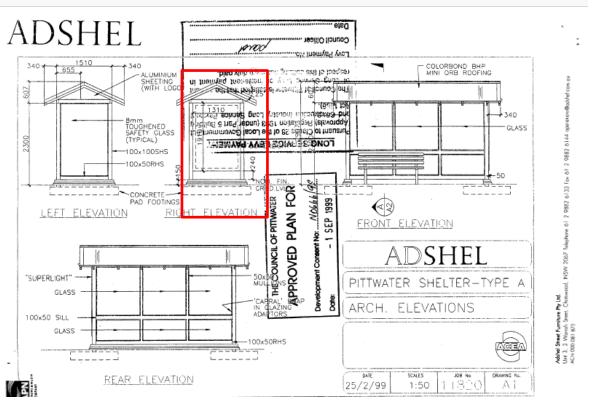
Shelter C1 DA0666/99 Stamped Elevations 1 of 2
